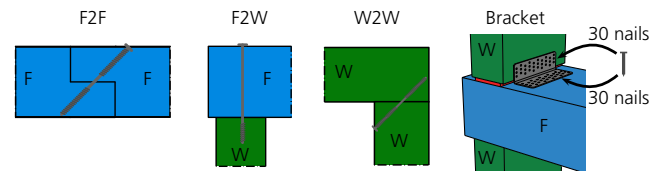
Fastener installations in the building: floor panels (F) are connected to wall panels (W)
